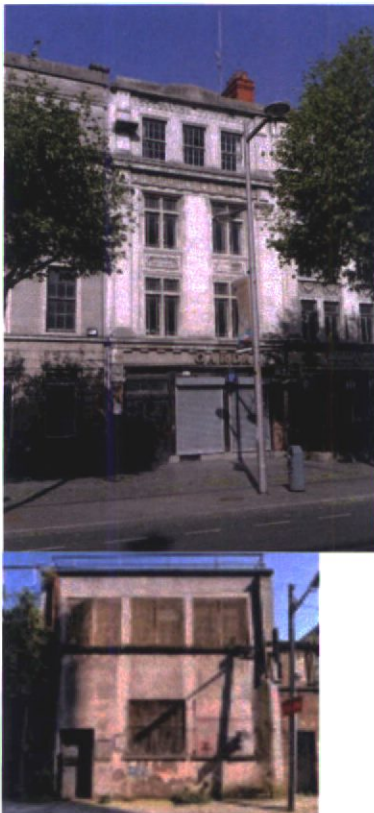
Front and rear elevation of No.44 O'Connell Street Upper together with Moore Lane elevation
